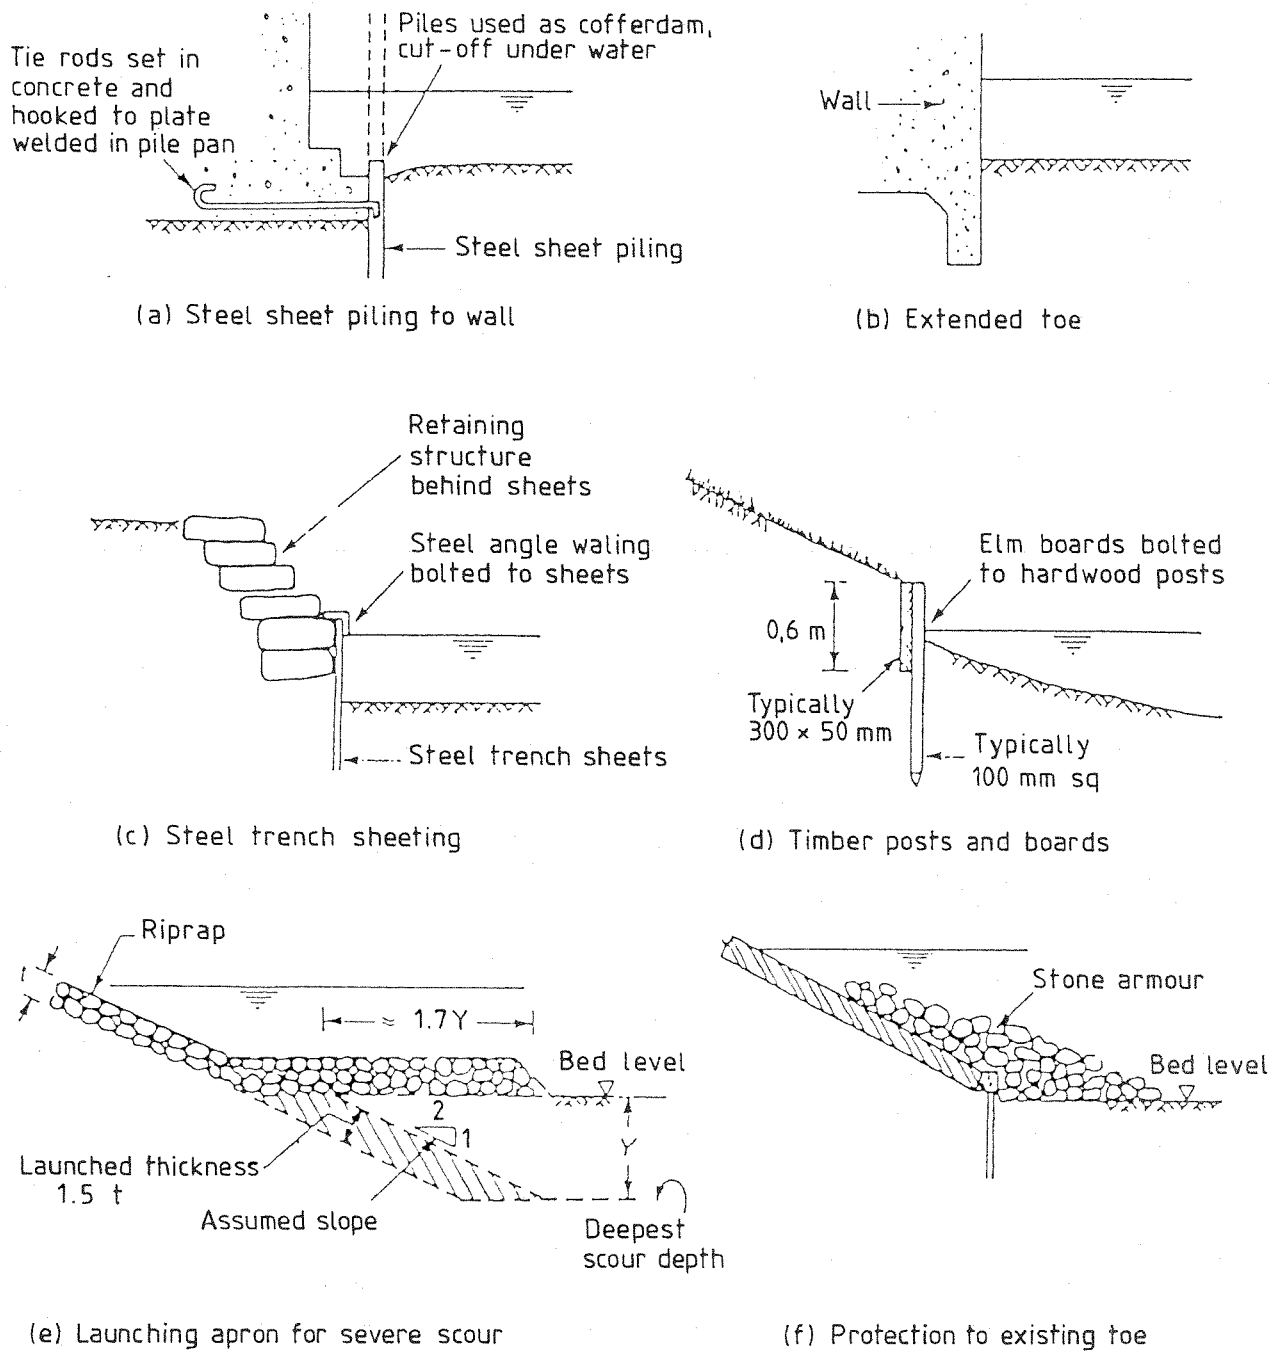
EXAMPLES OF TOE DETAILS
